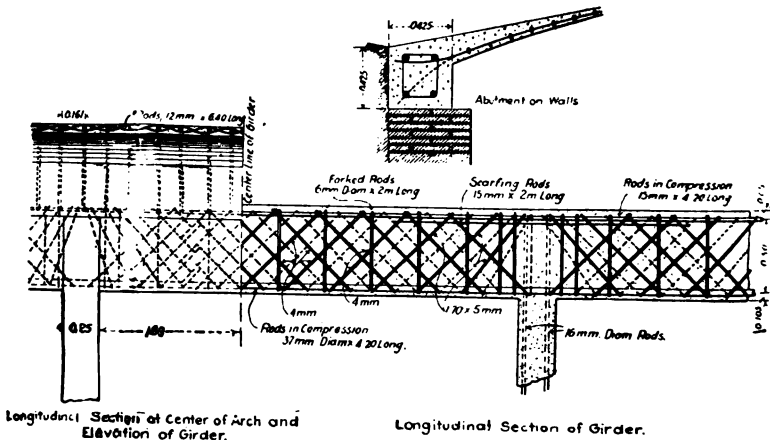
Roof Construction for Reservoir at Madrid, Spain.
